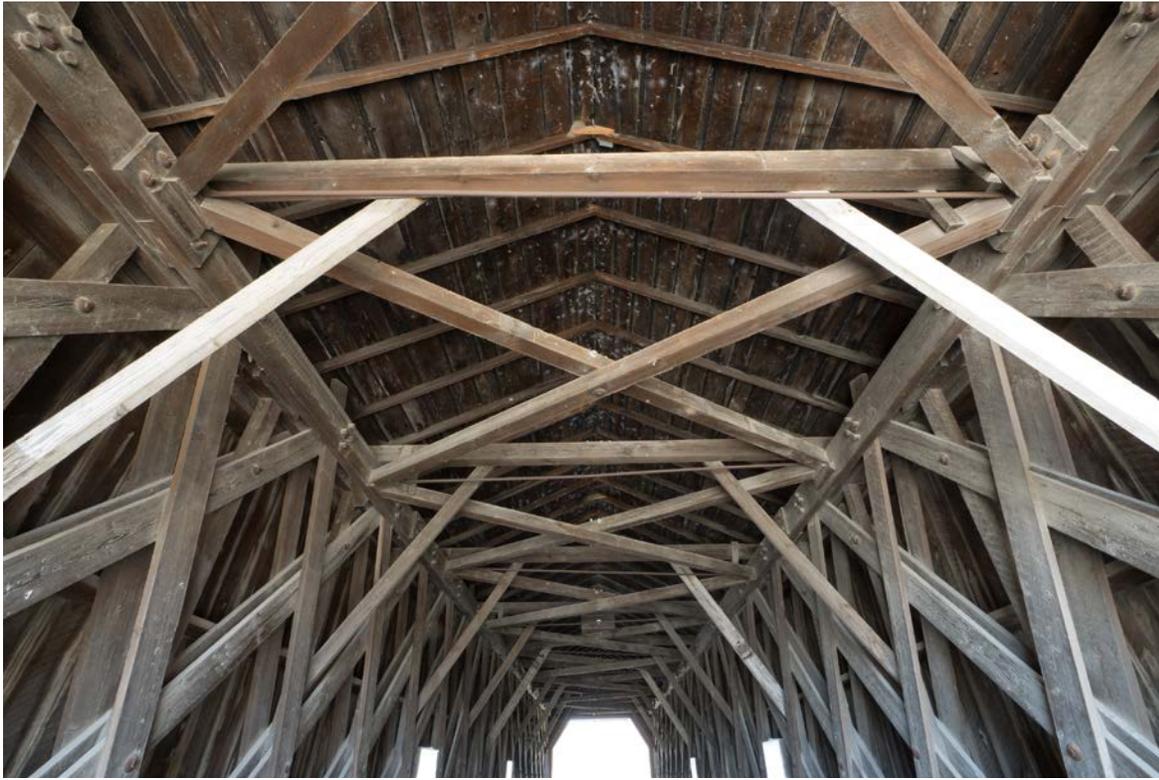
Interior view of truss and upper lateral bracing; view to north.
